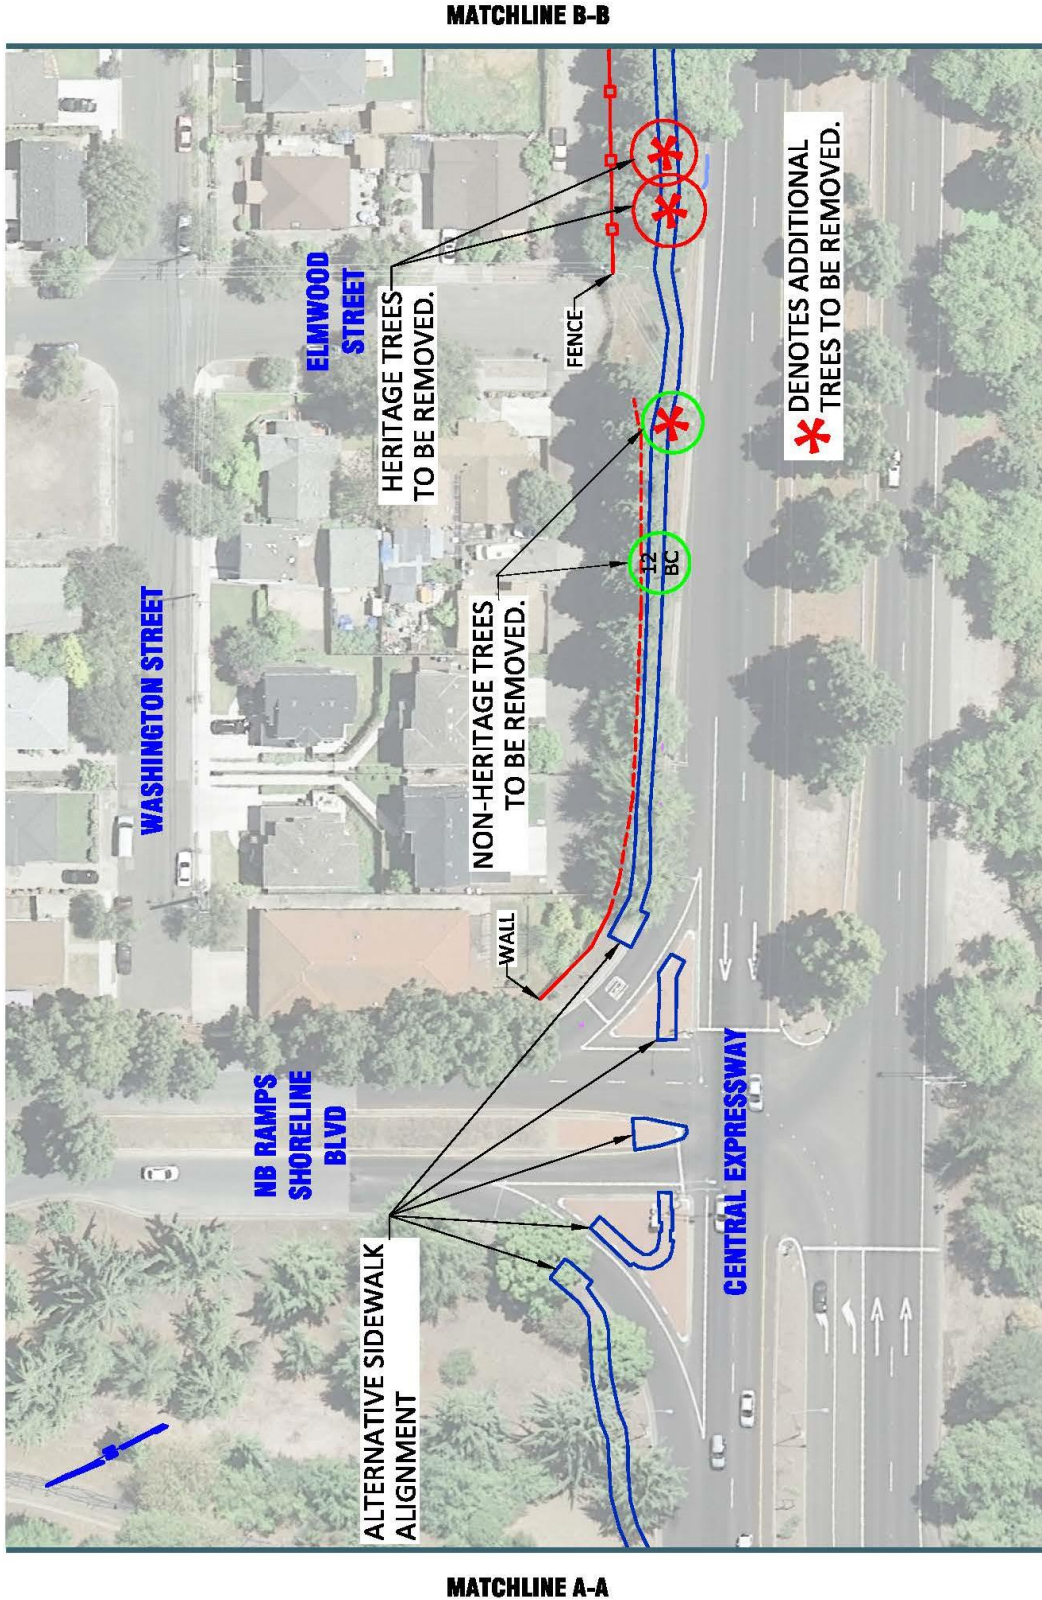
Exhibit K – Alternative Sidewalk Alignment and Tree Removal Locations
